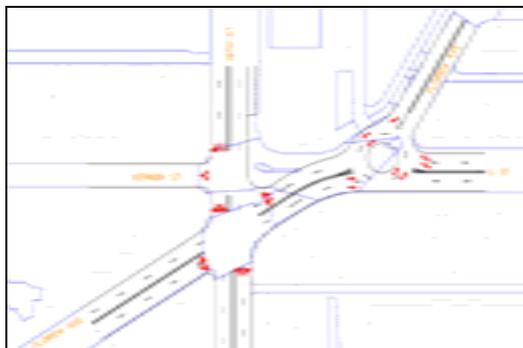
Preliminary alternative configurations for 18th Street and Florida Avenue (not to scale)
